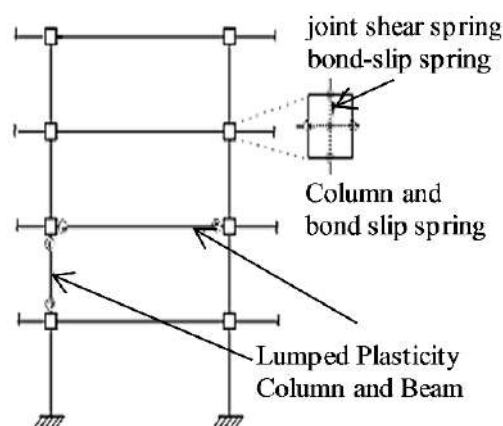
Schematic representation of frame construction members (FEMA P695, 2009)
